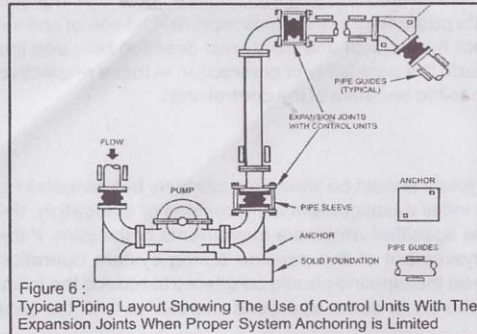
Typical Piping Layout Showing The Use of Control Units With The Expansion Joints When Proper System Anchoring is Limited
